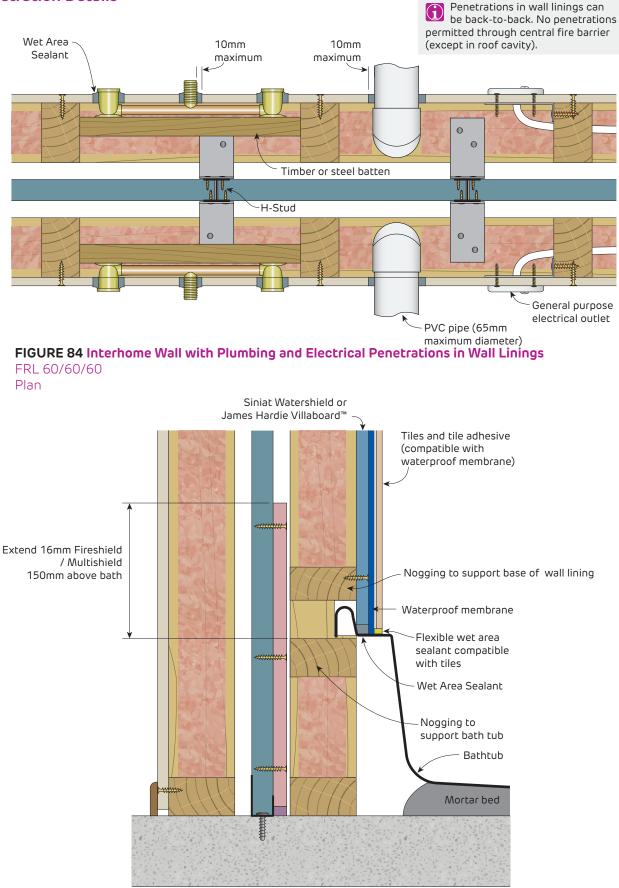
Interhome Wall with Integrated Bath Tub in Wet Areas FRL 60/60/60 Section
